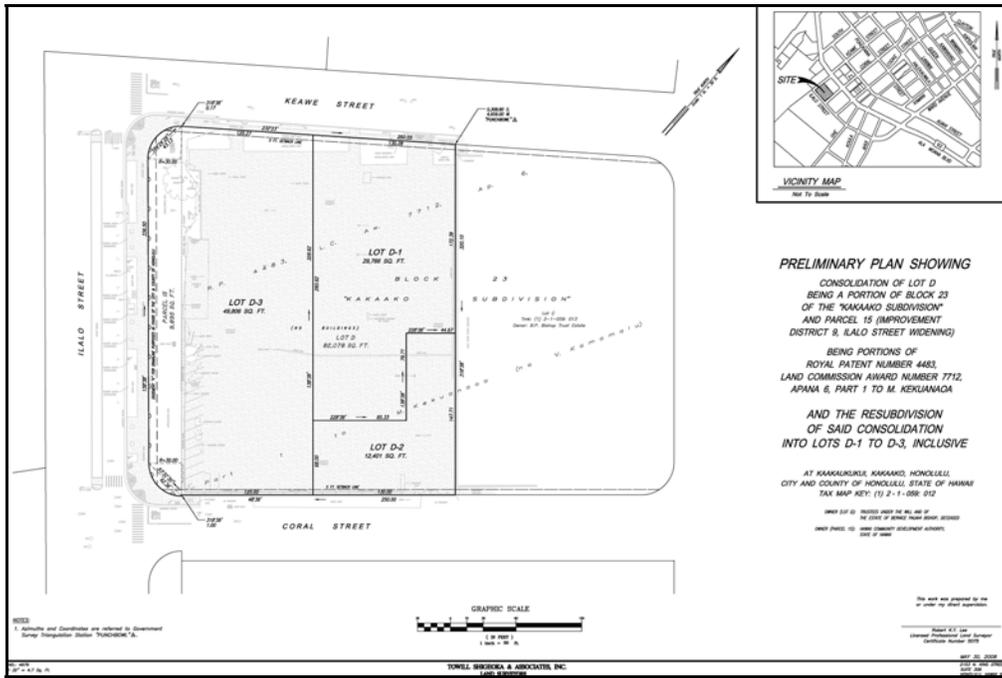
Preliminary Subdivision Plan for Preferred Cooling Station Site
